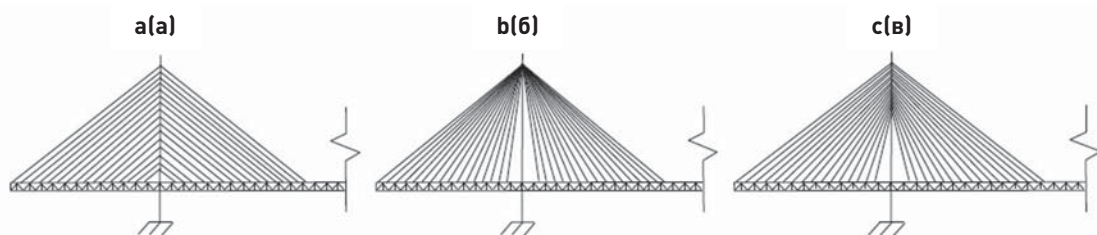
Schemes of cable-stayed bridges: a – harp system; b – fan system; c – semi-harp system
